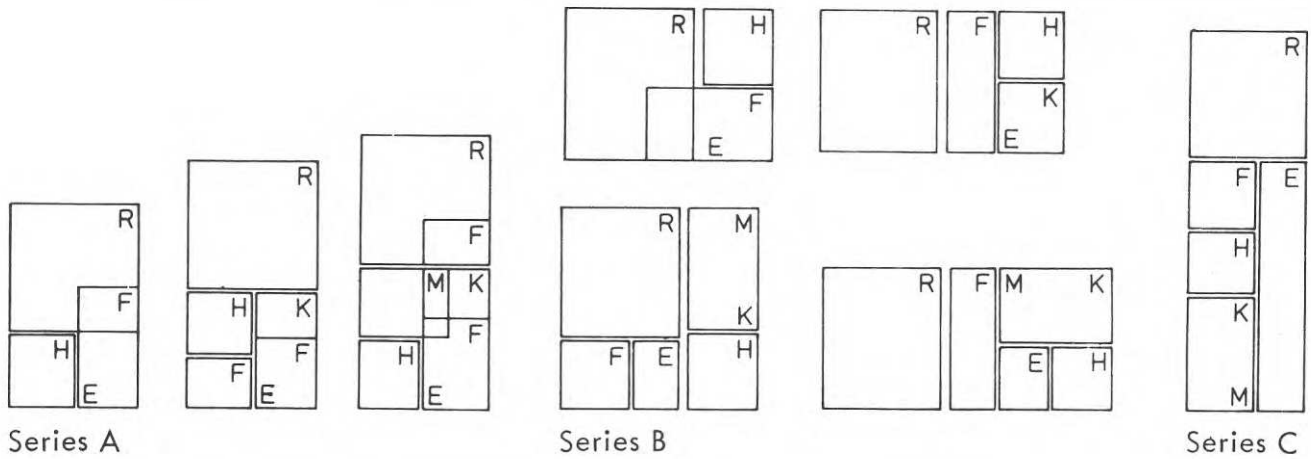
Plans. Examples taken from the different series. Scale 1:200.
